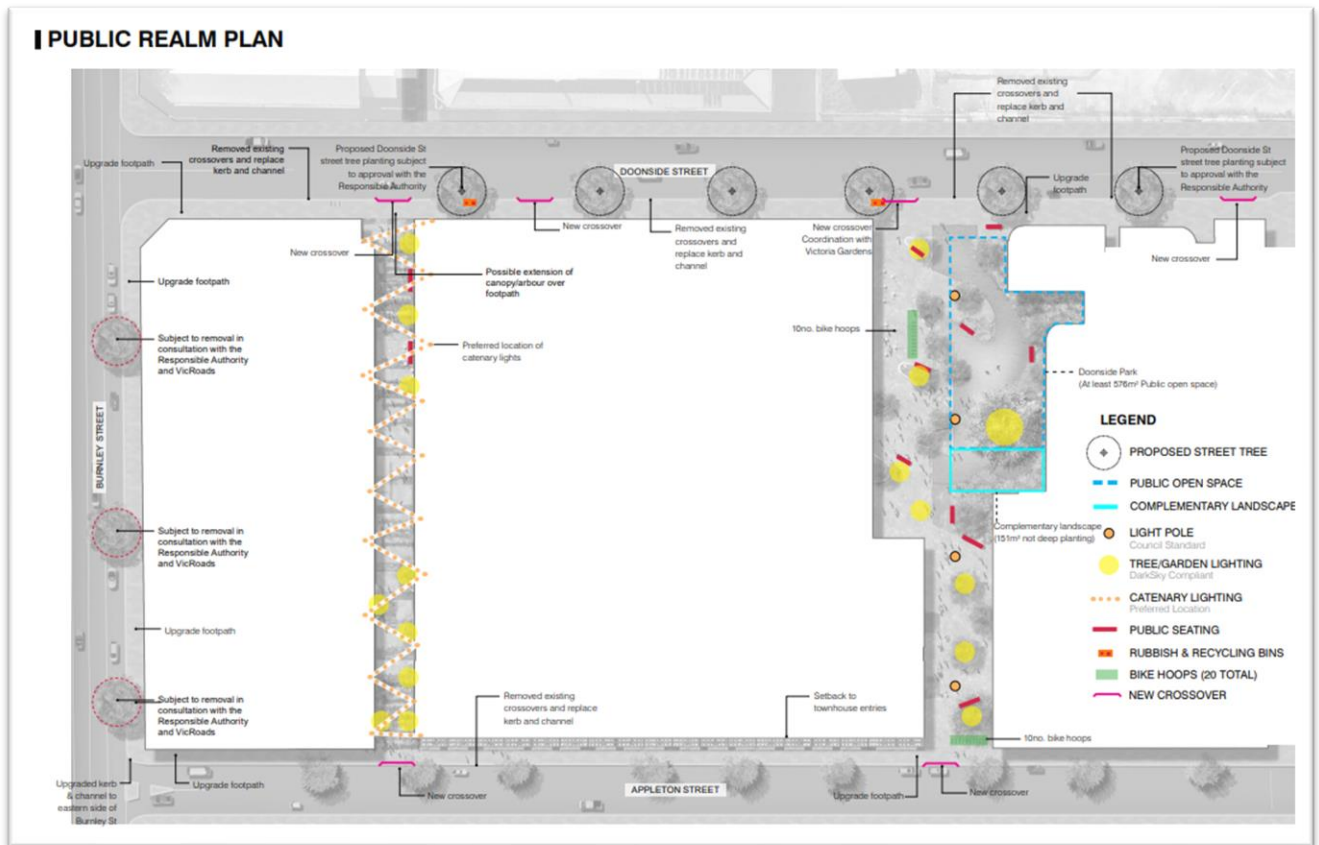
Public Realm plan. Source: Landscape Plan (TCL 2023)
